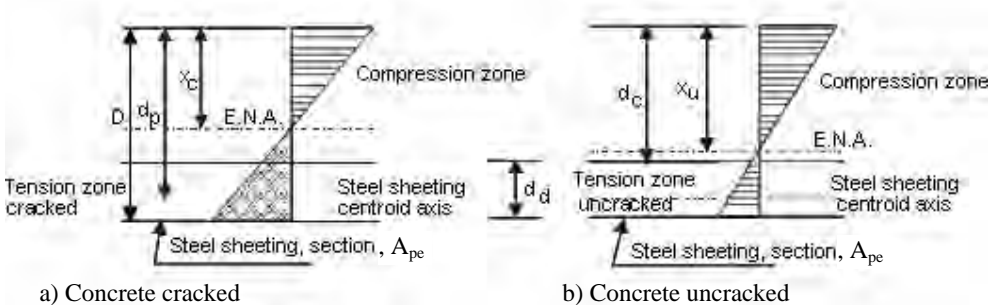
Second moment of Inertia calculation for cracked and un-cracked cross-sections under sagging moment
